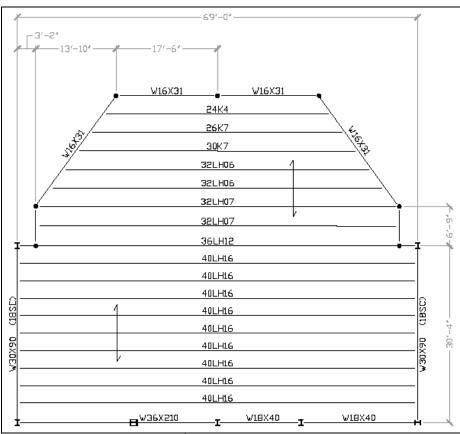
Partial 2<sup>nd</sup> Floor Framing Plan – Existing System
